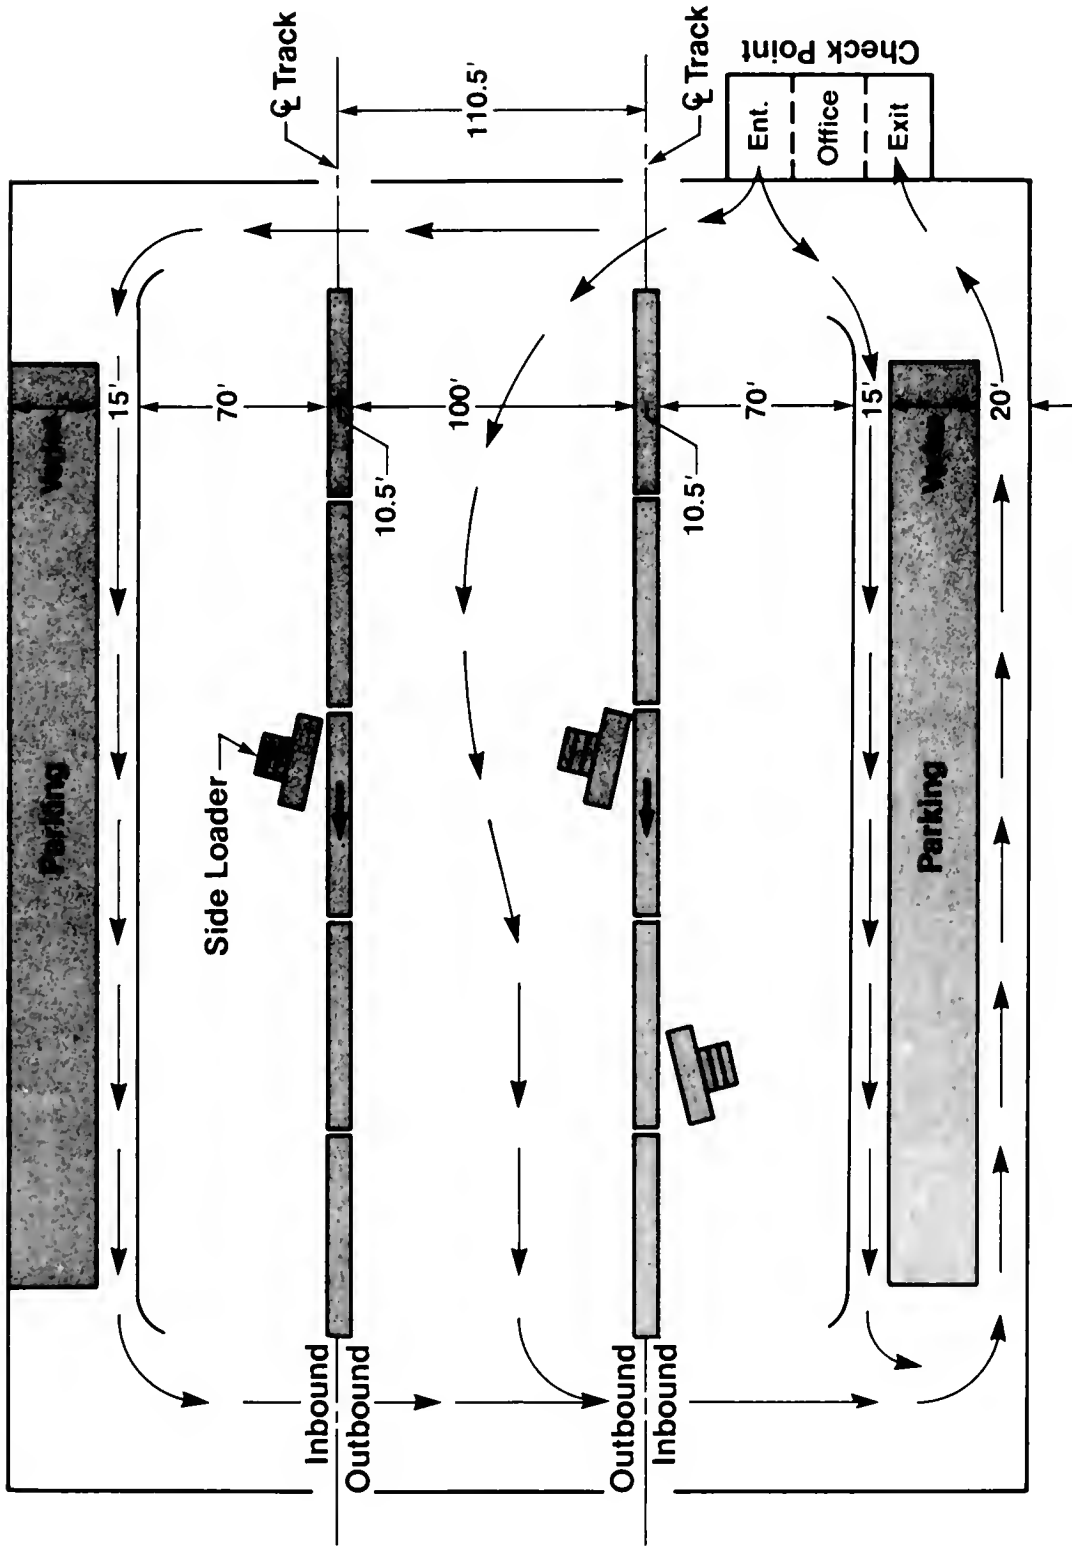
Medium-Volume Terminal With Side Loading and Outside Parking
